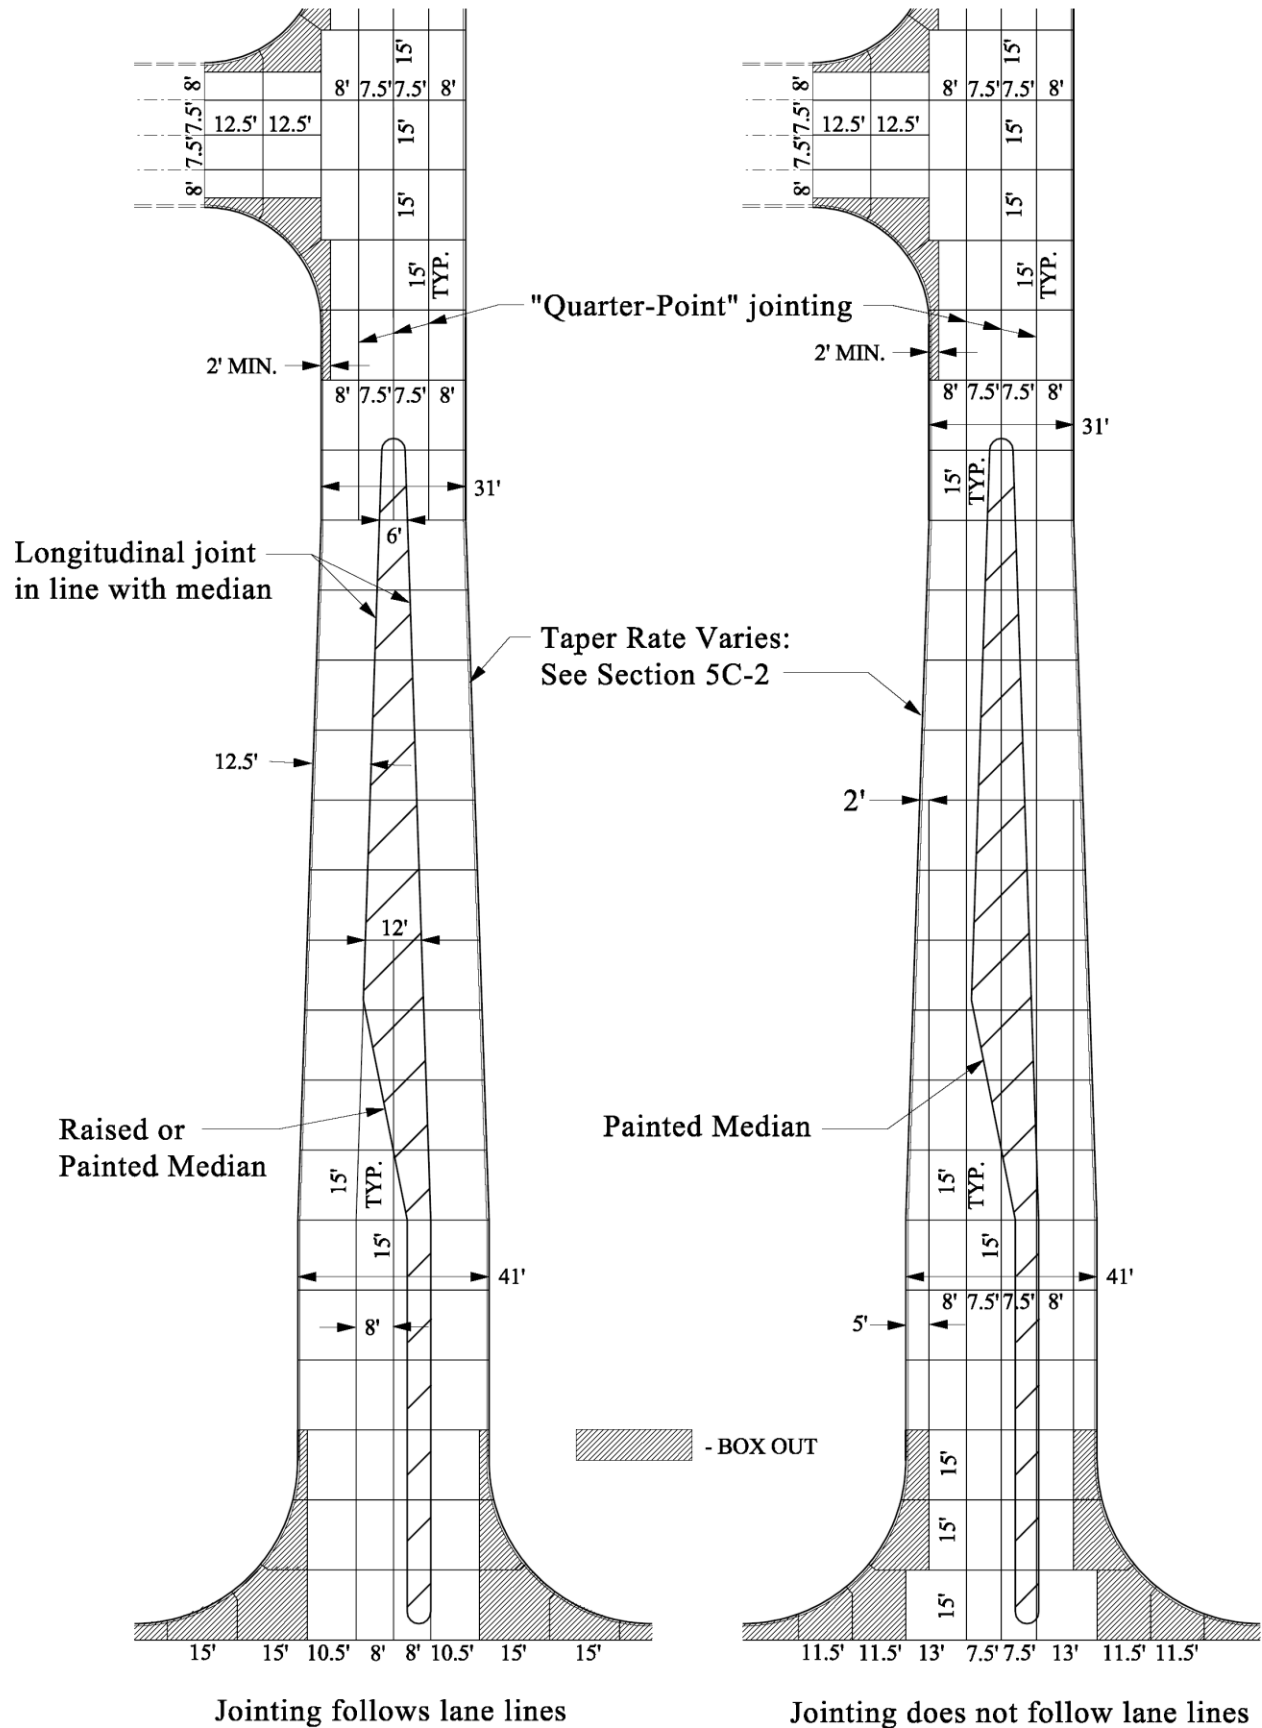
G-3.04: Quarter-Point Jointing - Concentric Widening (31 Foot to 41 Foot)
